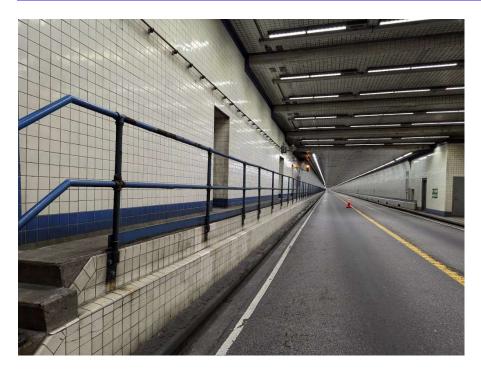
Tunnel Roadway – General View of the Concrete Barrier (Lined with Tile), Curb, Sidewalk, Pedestrian Railing, and Tunnel Liner Wall (Looking North)
